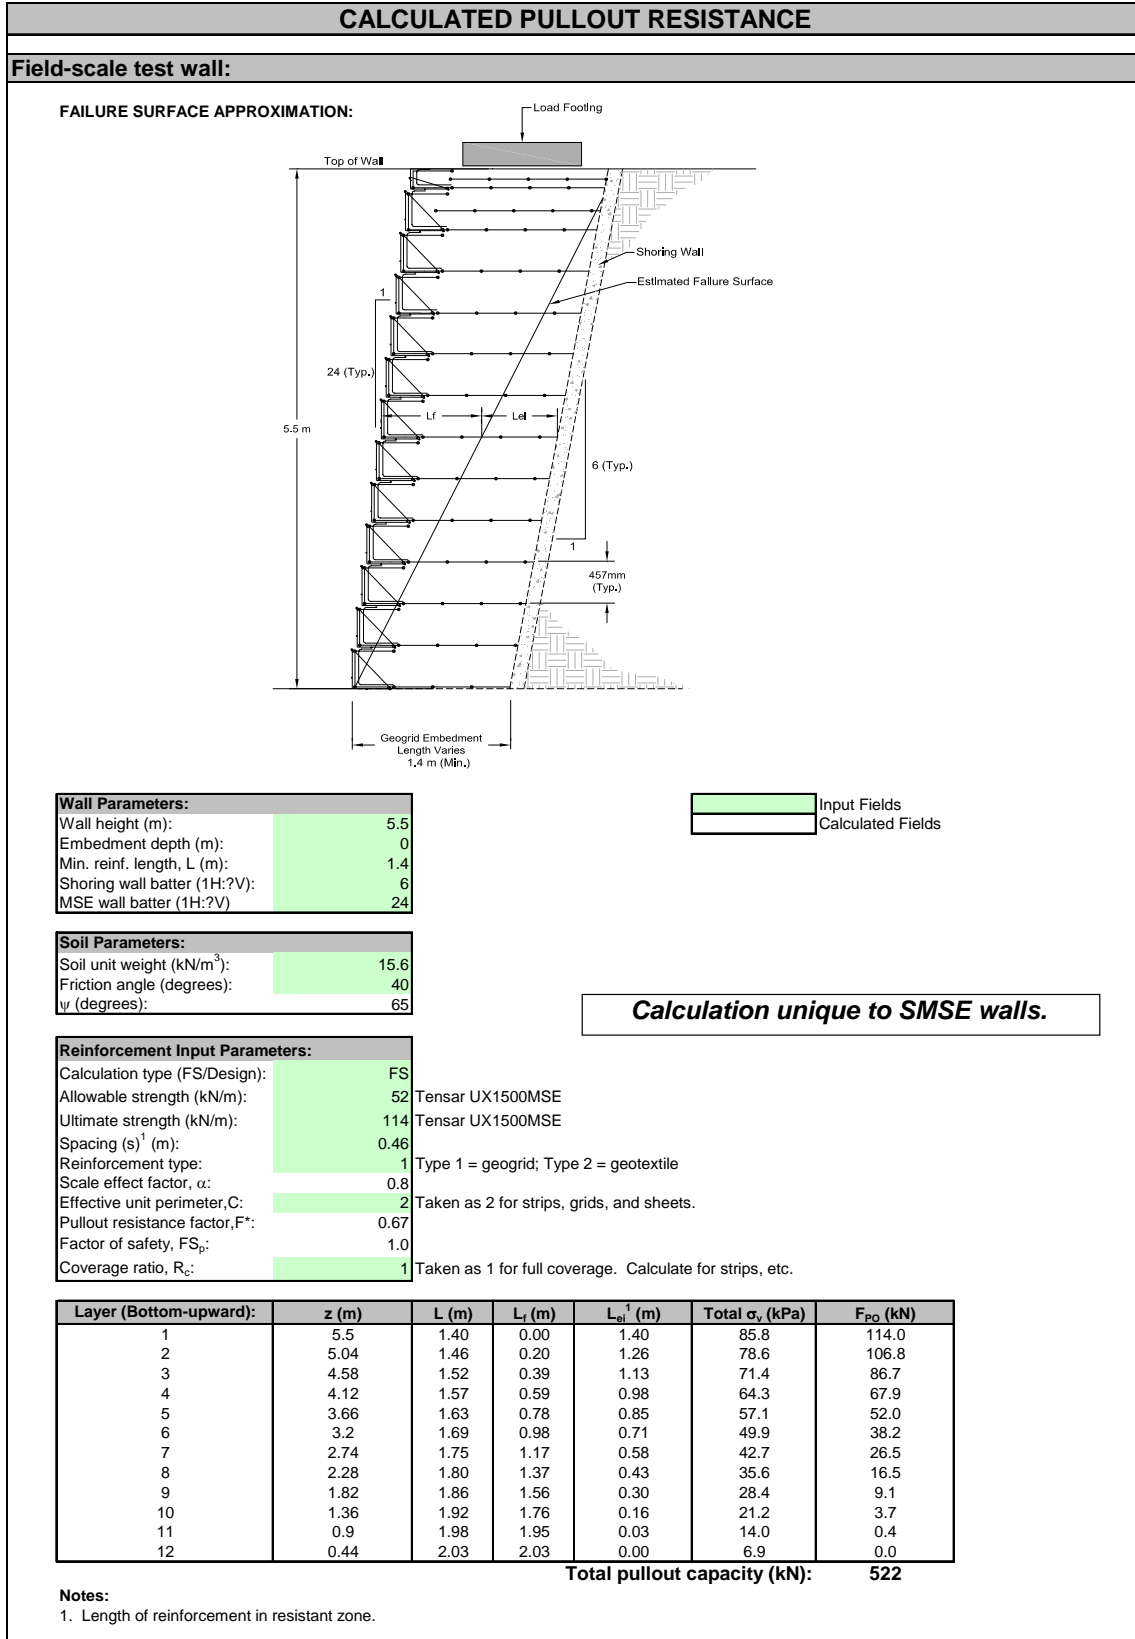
Calculation. Calculation of pullout resistance for test wall.
